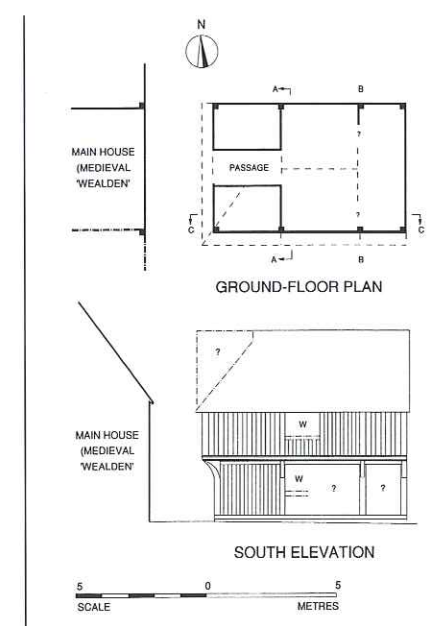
The detached kitchen at Comphurst (Wartling, Sussex) showing its superficial house-like appearance. Note the relationship of the building to the main house on the west (left) side, and the passage in the kitchen that leads towards the house.
